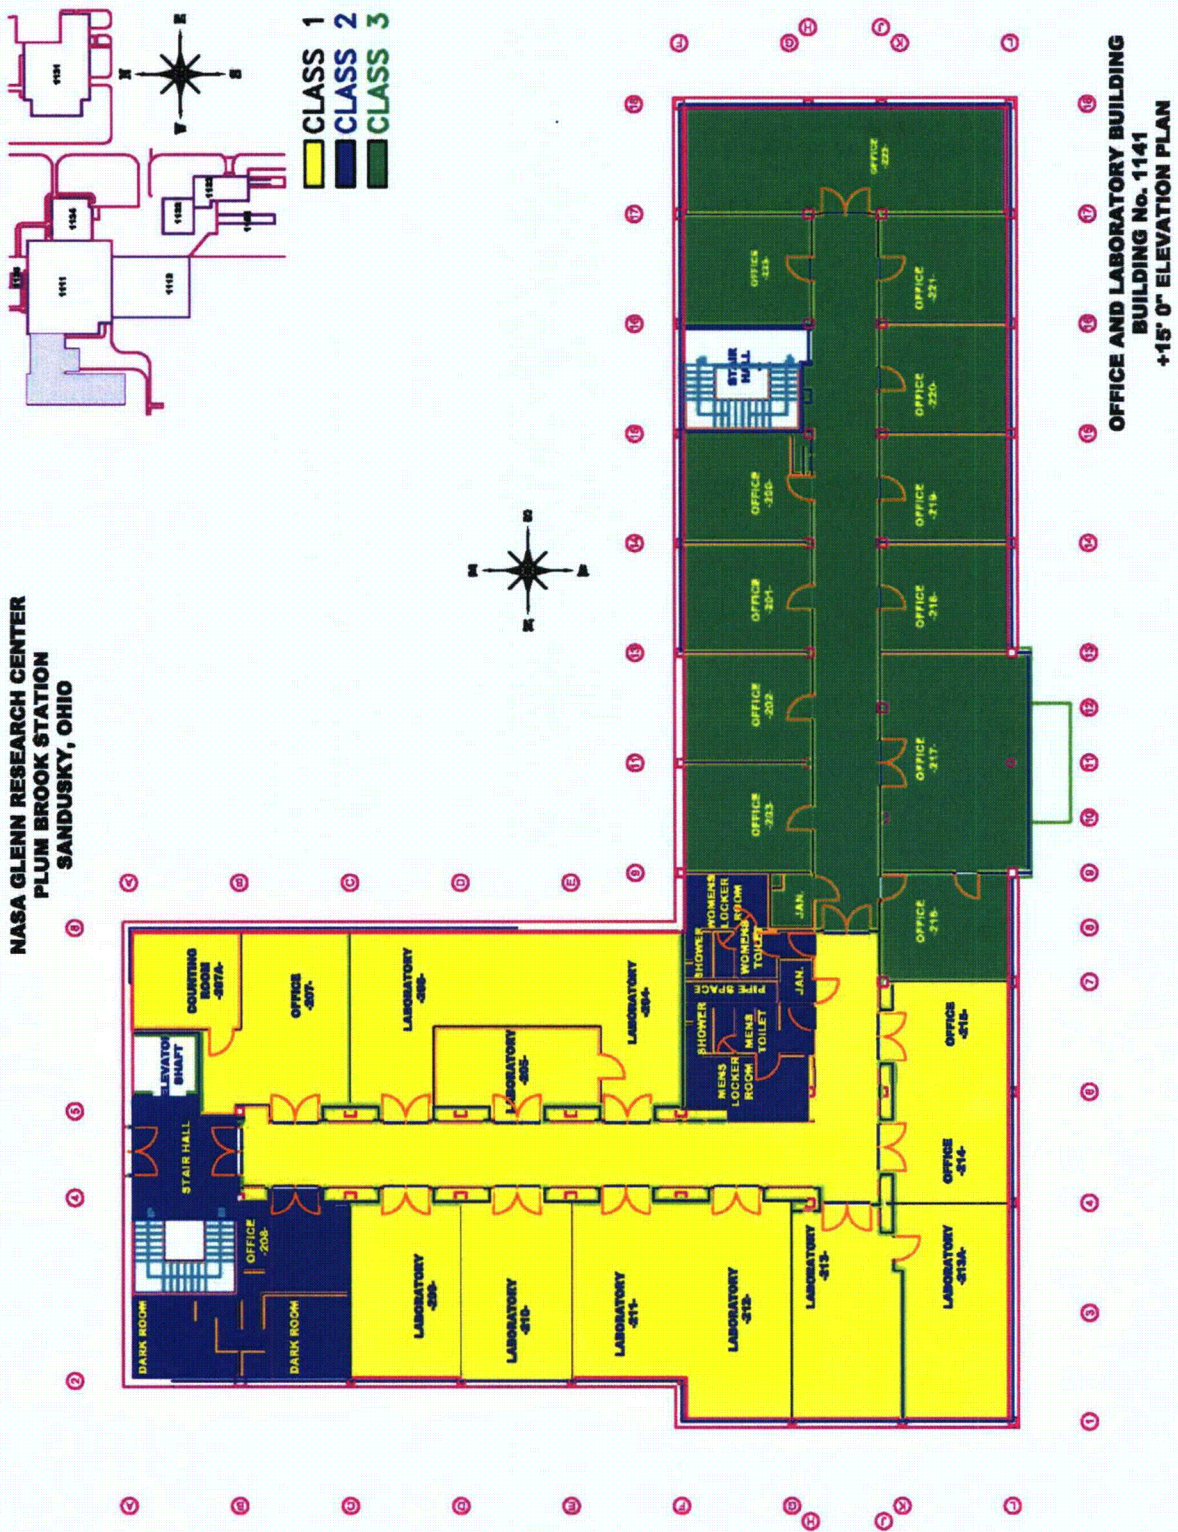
Reactor Office and Laboratory Building 2nd Floor Elevation
